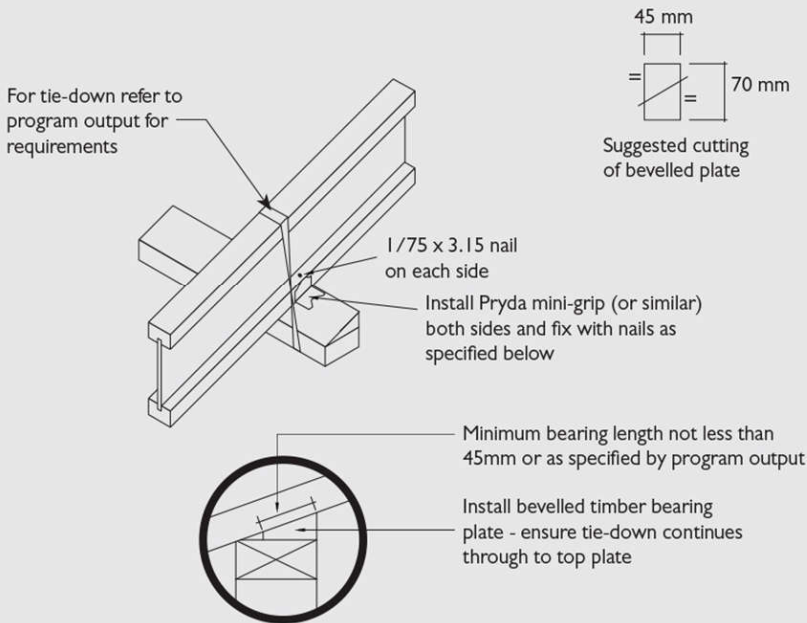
Rafter overhang - horizontal soffit with bevelled plate supports
